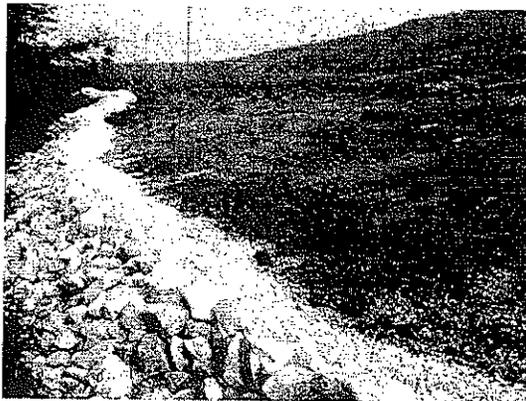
Area not stabilized at rock berm at Sta. 132+00-135+50
